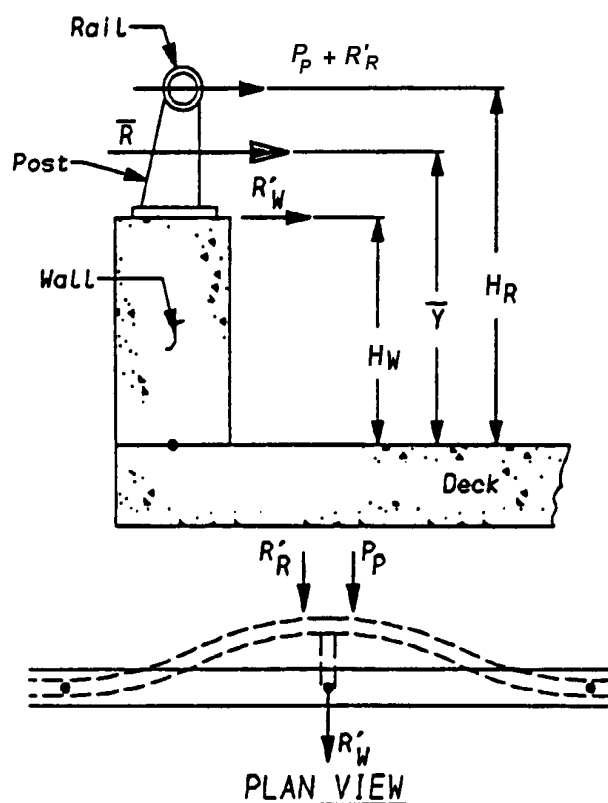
Concrete Wall and Metal Rail Evaluation—Impact at Post
